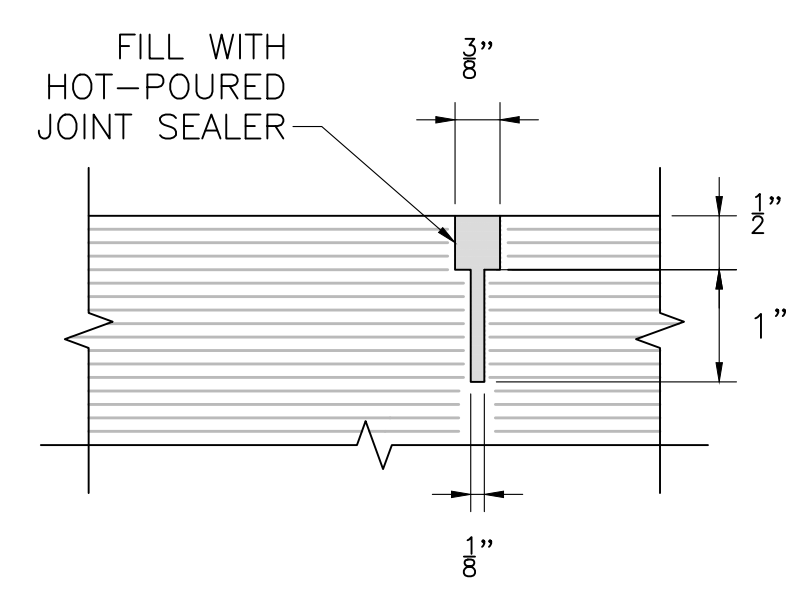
DETAILS AT ABUTMENT - SIDEWALK SECTION
